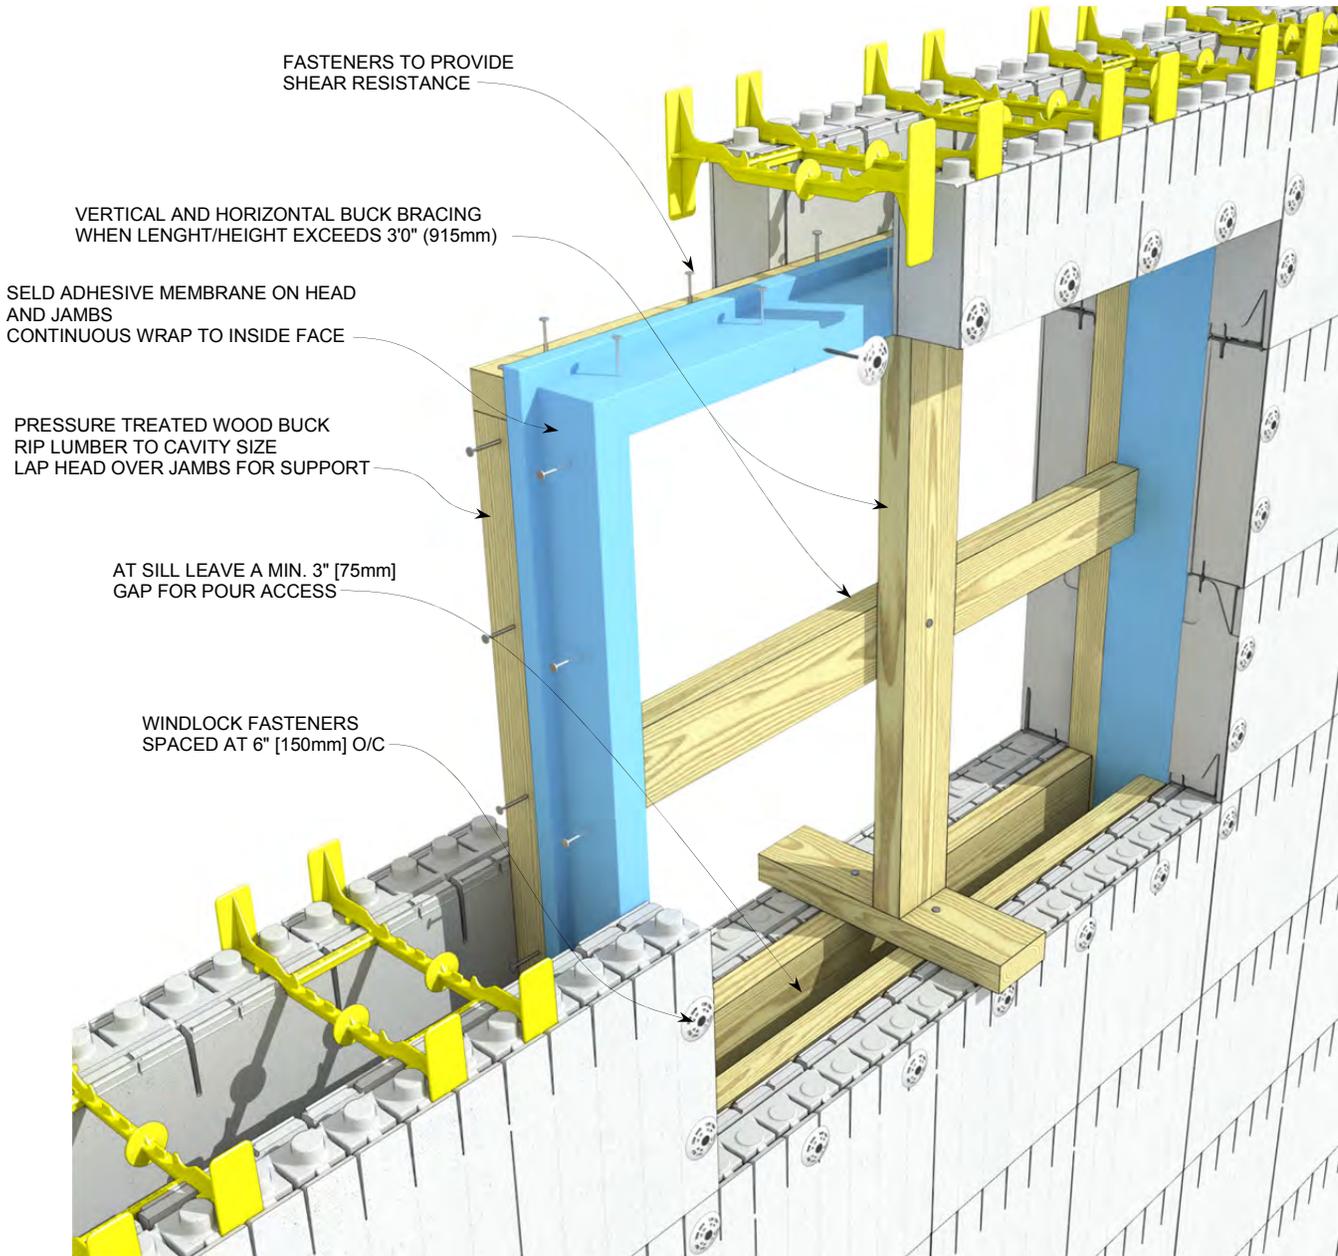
Internal buck-out with water-stop flashing, bracing, and ICF panels fastened to wood members
